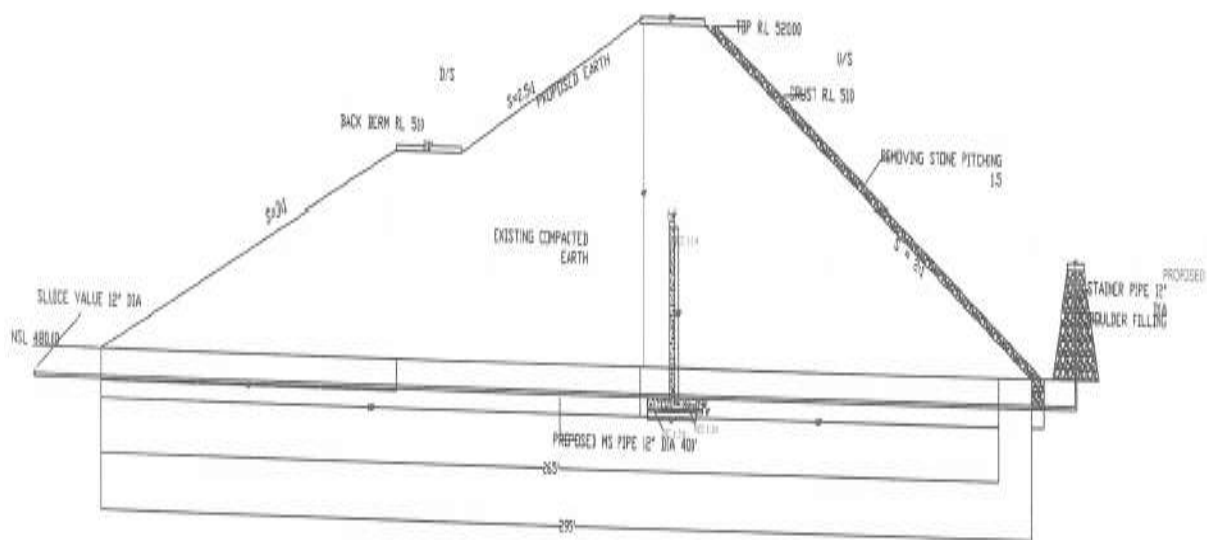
Typical X-Section Habib Dara II Delay Action Dam
